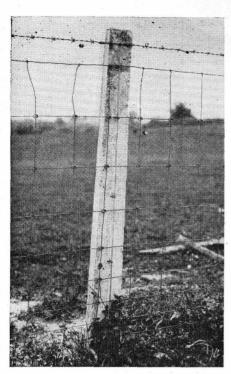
Concrete posts can be made with farm labor and equipment.
